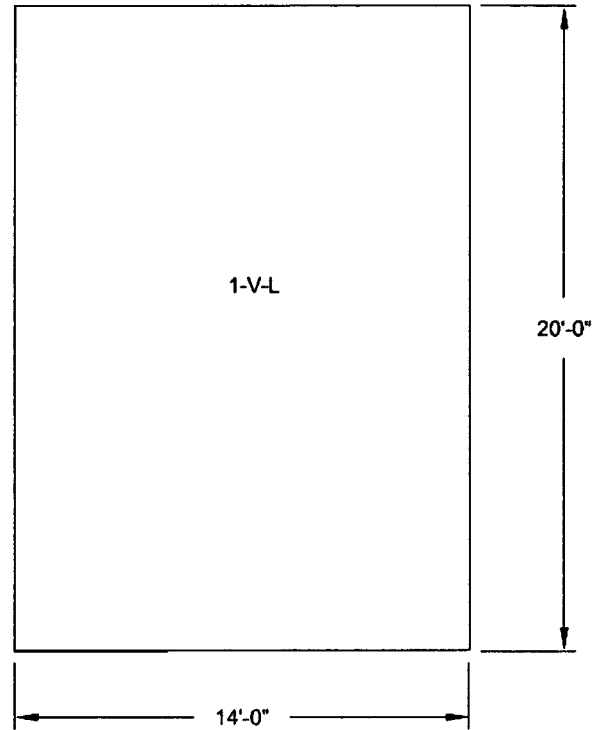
H.6-173 Wall 9 Looking From Outside Horizontal Reinforcement Zones
